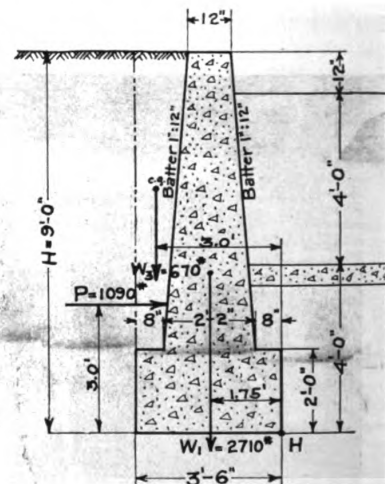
Method of constructing a reservoir where it is to be in excavated material.
